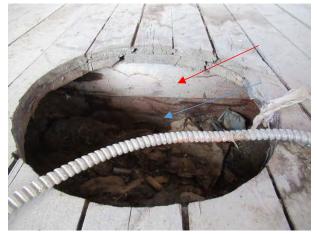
Chimney penetration through flooring, allowing visual review of floor joists. Note 2"x4" (red arrow) on top of 2"x6" (blue arrow) floor joists. [PCA, 2018]
